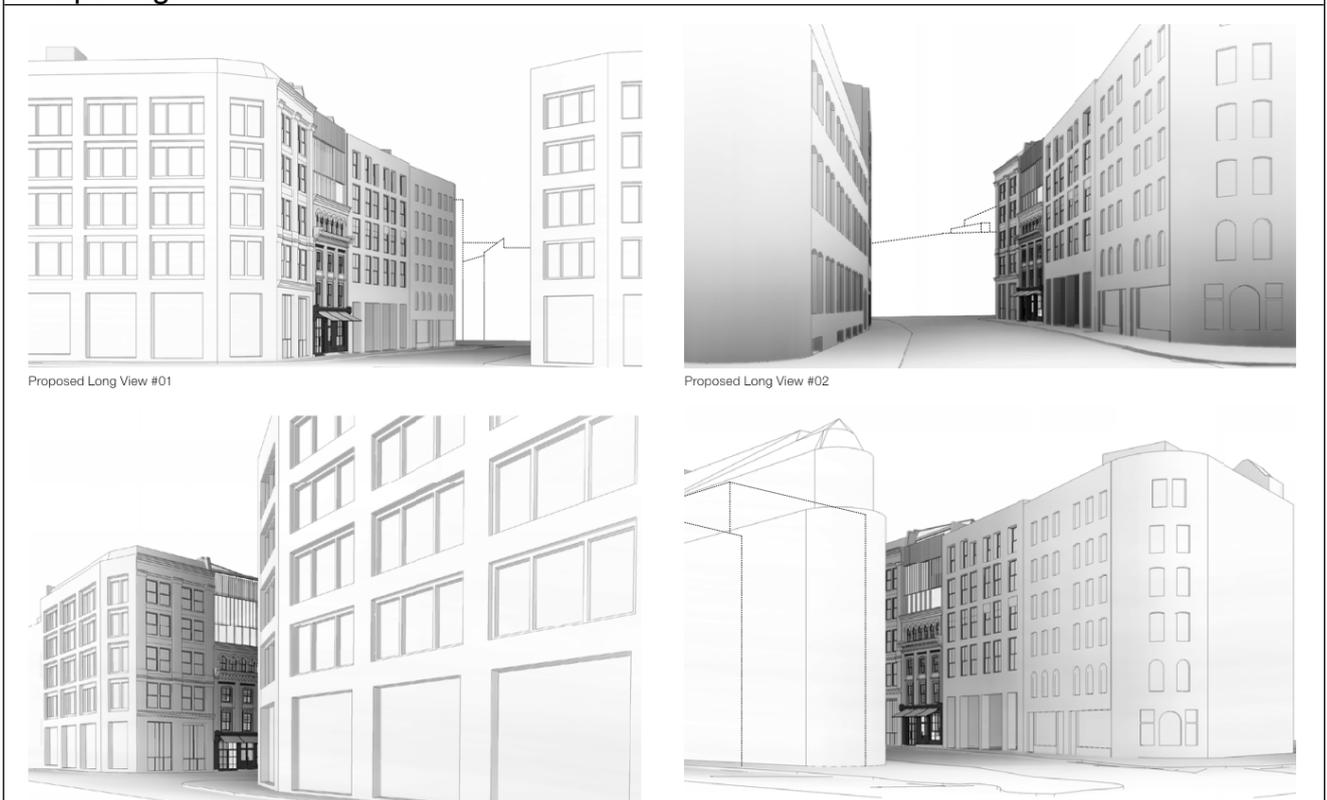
Marked up longer views showing the roof top plant will not be visible from street view
